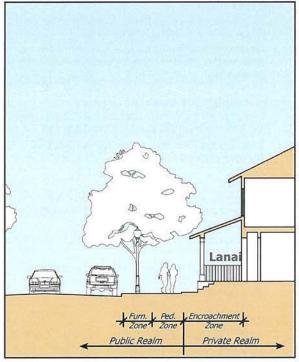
Cross Section, Lanai and Yard Frontage (Illustrative)
